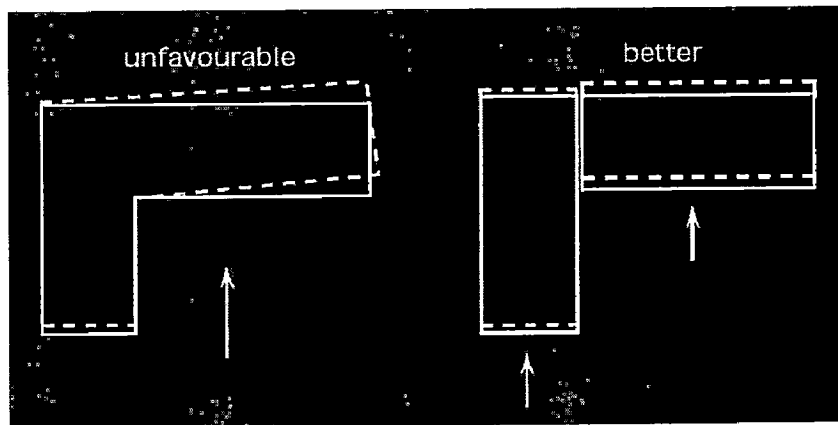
plans with re-entrant corners can be separated into rectangular plan shapes by a separation joint.
